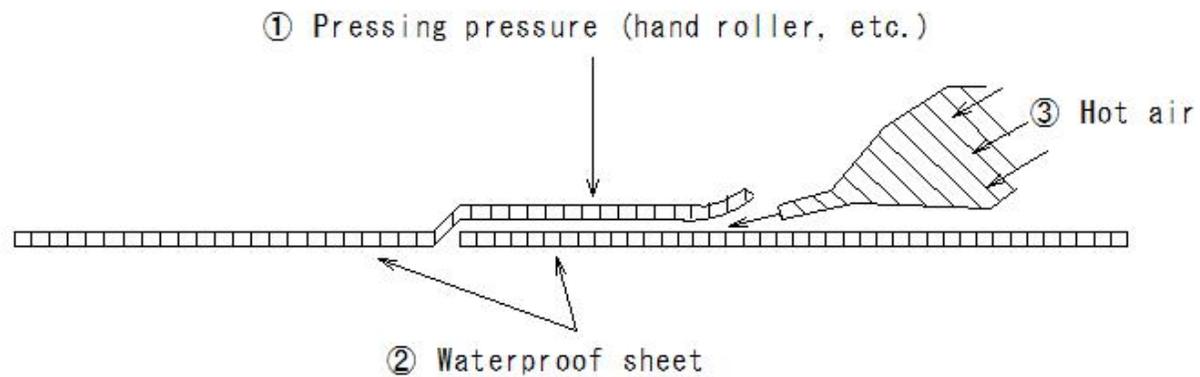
For portable hot air welding machine (synthetic resin sheets)
